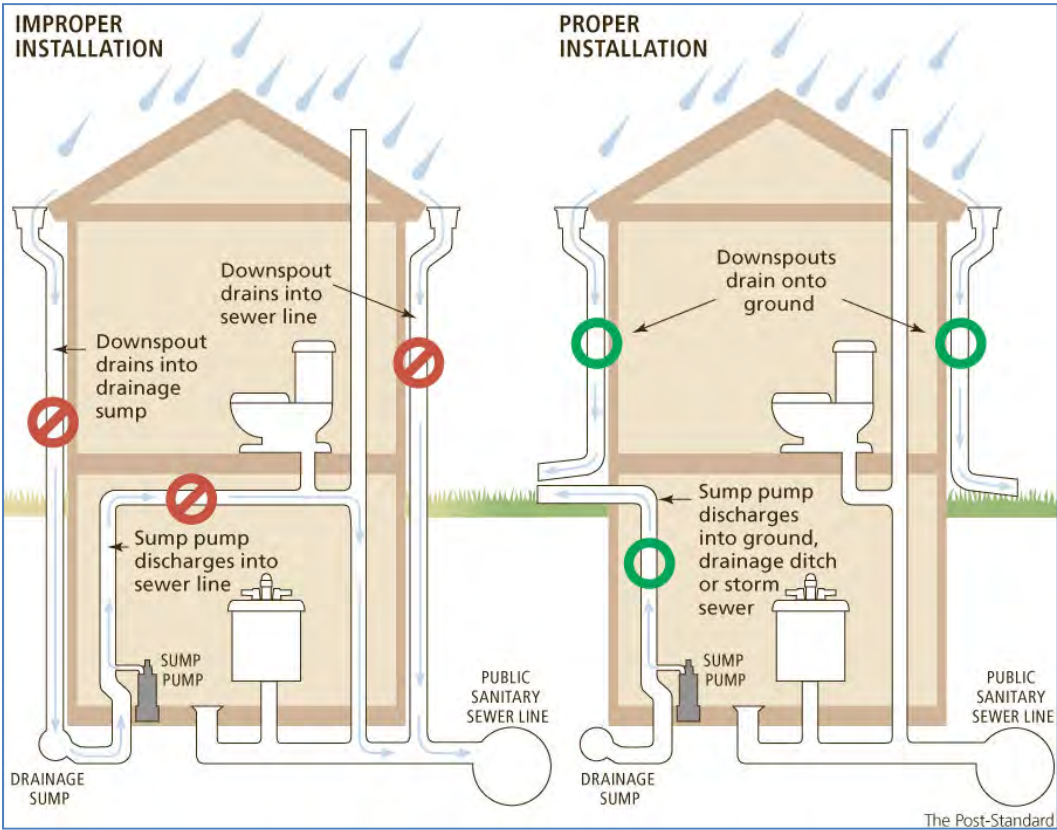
Installation of downspout disconnection (typical) (Source:www.syracuse.com)
